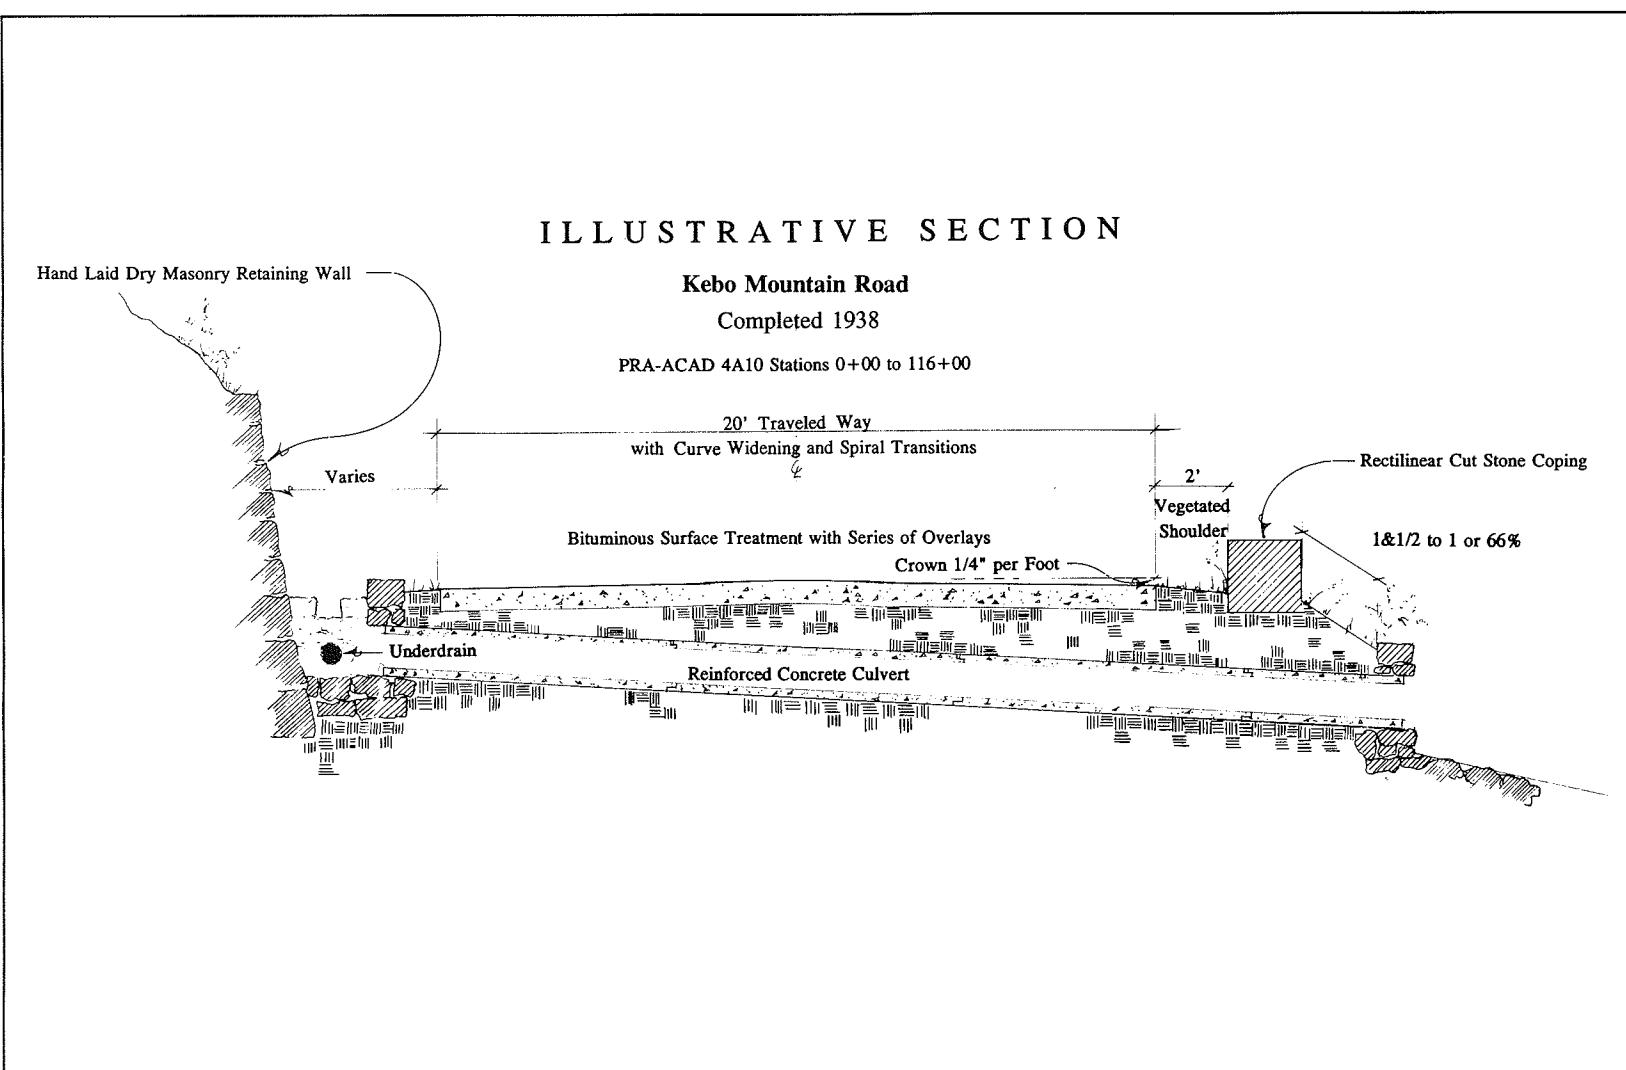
Illustrative cross-section, Kebo Mountain Road. Drawing by OCLP.
